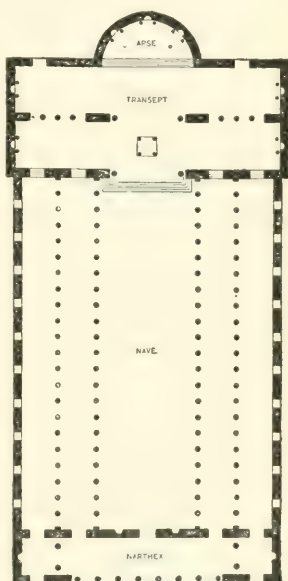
Plan of the Basilica of St. Paul beyond the walls.
